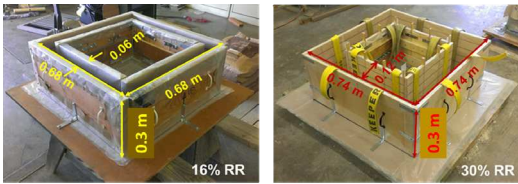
Wooden molds for soil-cement panel construction at 16% and 30% area replacement ratios.
